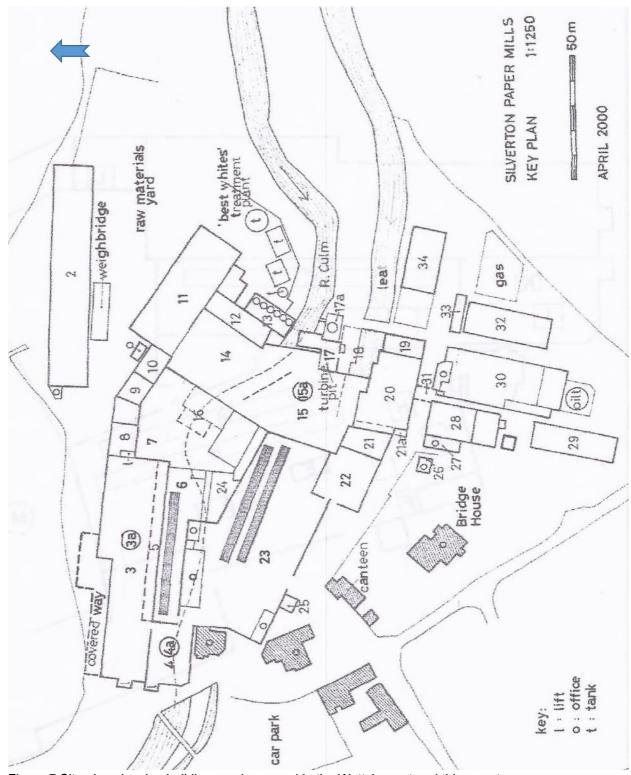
Site plan showing building numbers used in the Watts' report and this report.
